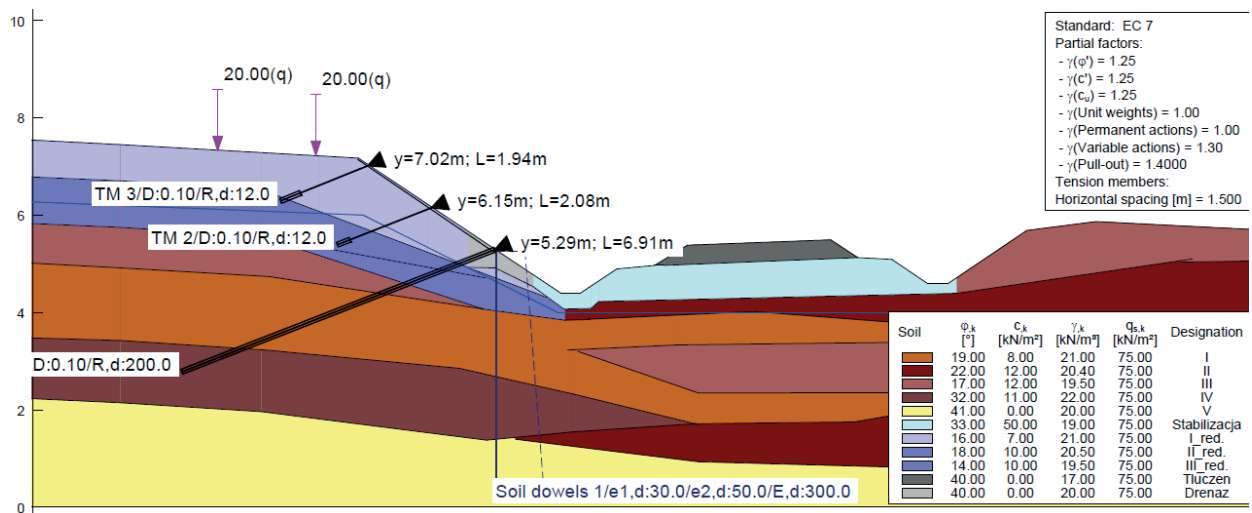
View of design cross-section with calculations for selected point 33+400 (Geotechnical project BAARS, 2020)
